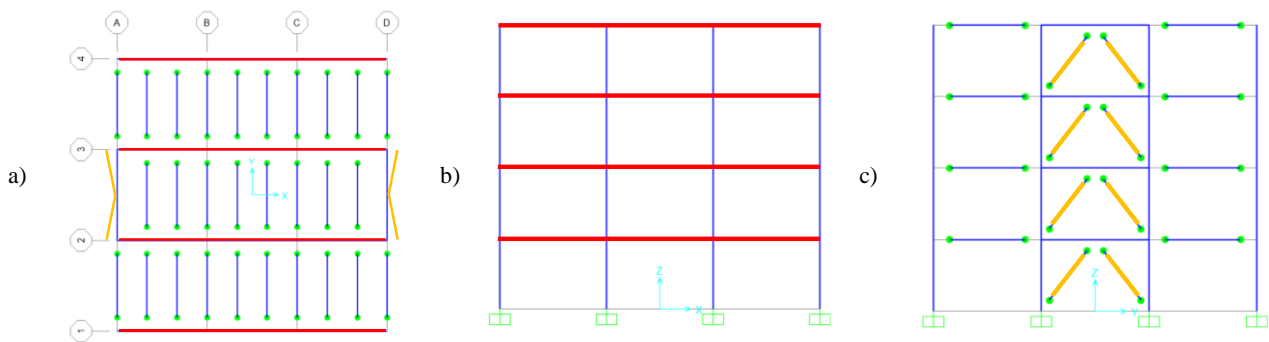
a) Plan view; b) transversal MRF*; c) longitudinal CBF of the case study structure.
